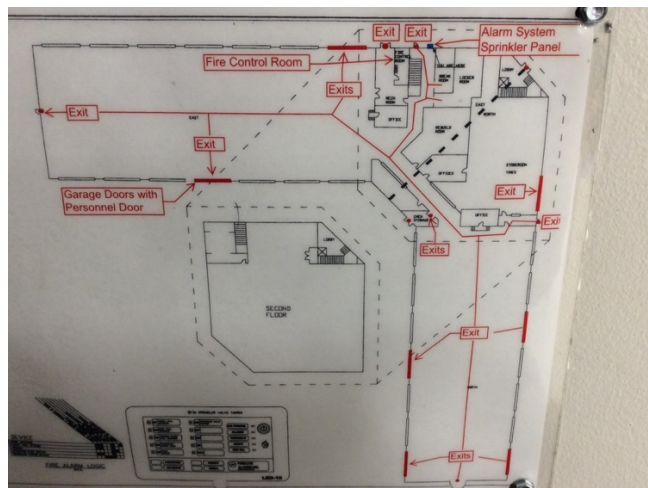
Building floor plan – Equipment Bureau building in Arlington, VA
